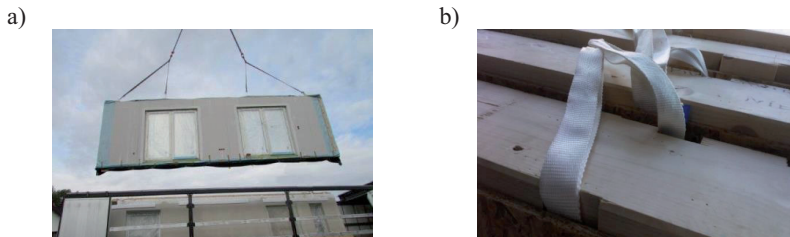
Wall lifting: a) at the stage of wall assembling on site, b) polyester sling braiding the top plate of panel
